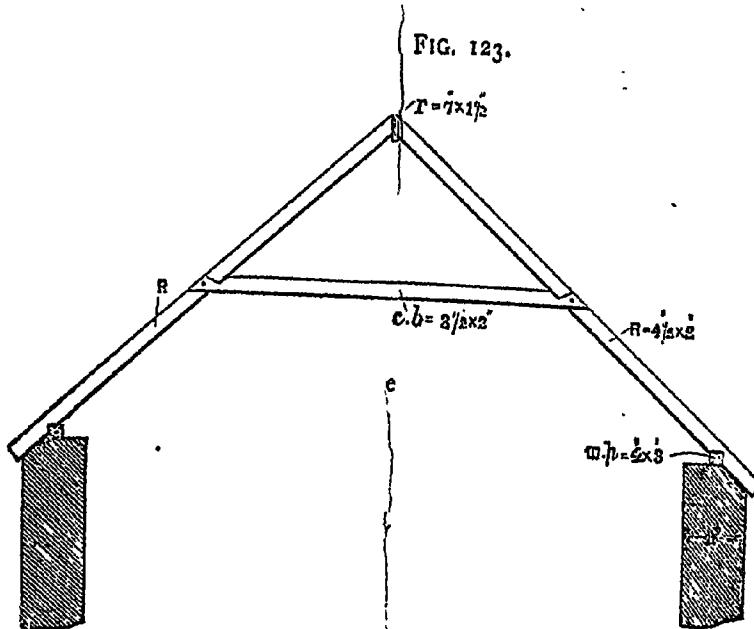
is the elevation of a collar beam roof truss, *r* is the ridge piece in section; *R*, *R* are the rafters; *w.p.* is the wall-plate; *c.b.* is the collar beam, which is slightly notched into the rafter. The rafters are placed 1 foot apart and are nailed to the ridge piece. The walls shown are of masonry or brick-work. Scale 4 feet = 1 inch.
